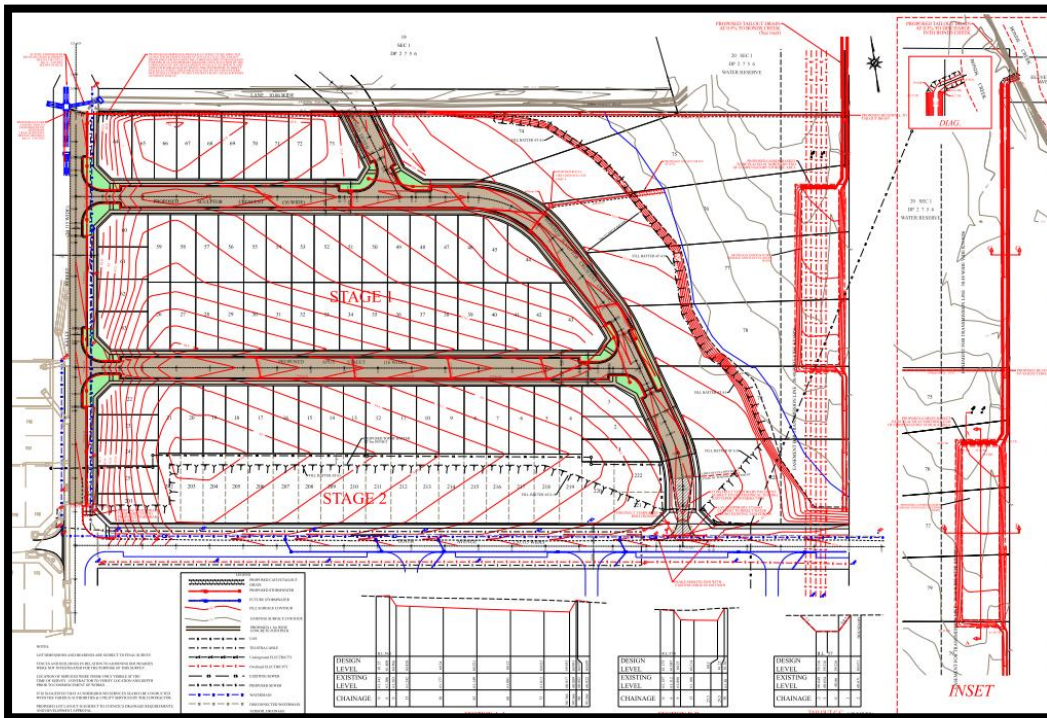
Stage 1 Engineering Plan Showing Proposed Centrelines and Sections Through Basin & Tailout (Source: R S. Canceri Pty Ltd)
